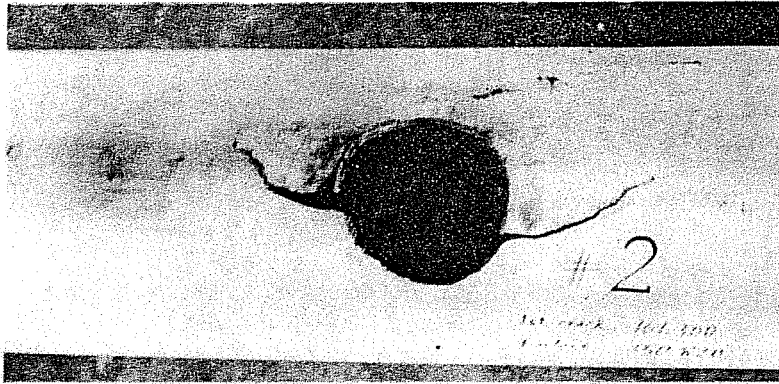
Fatigue failure of T-2 (cracked on one side)
